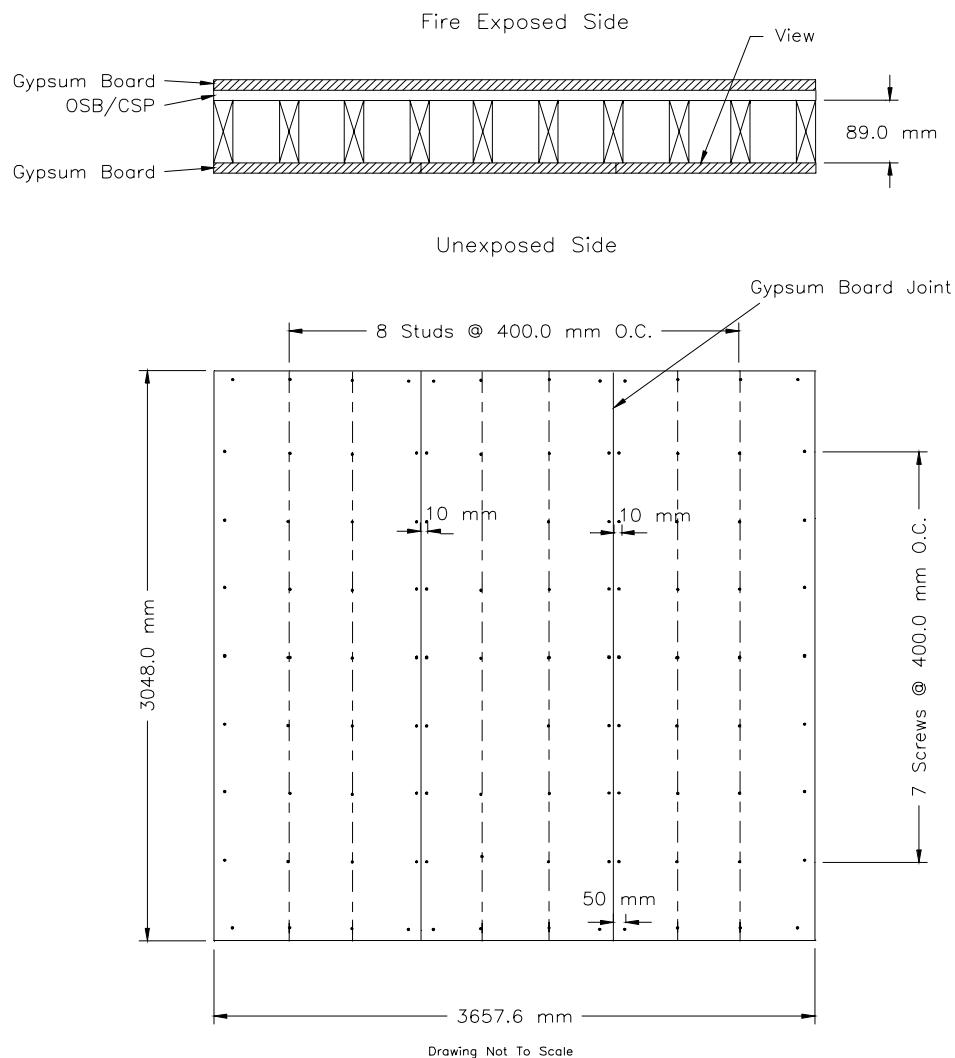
Screw Locations for Wood Stud Wall Assemblies, 2x1 Face Layer Fire Exposed Side (F19 and F20)
